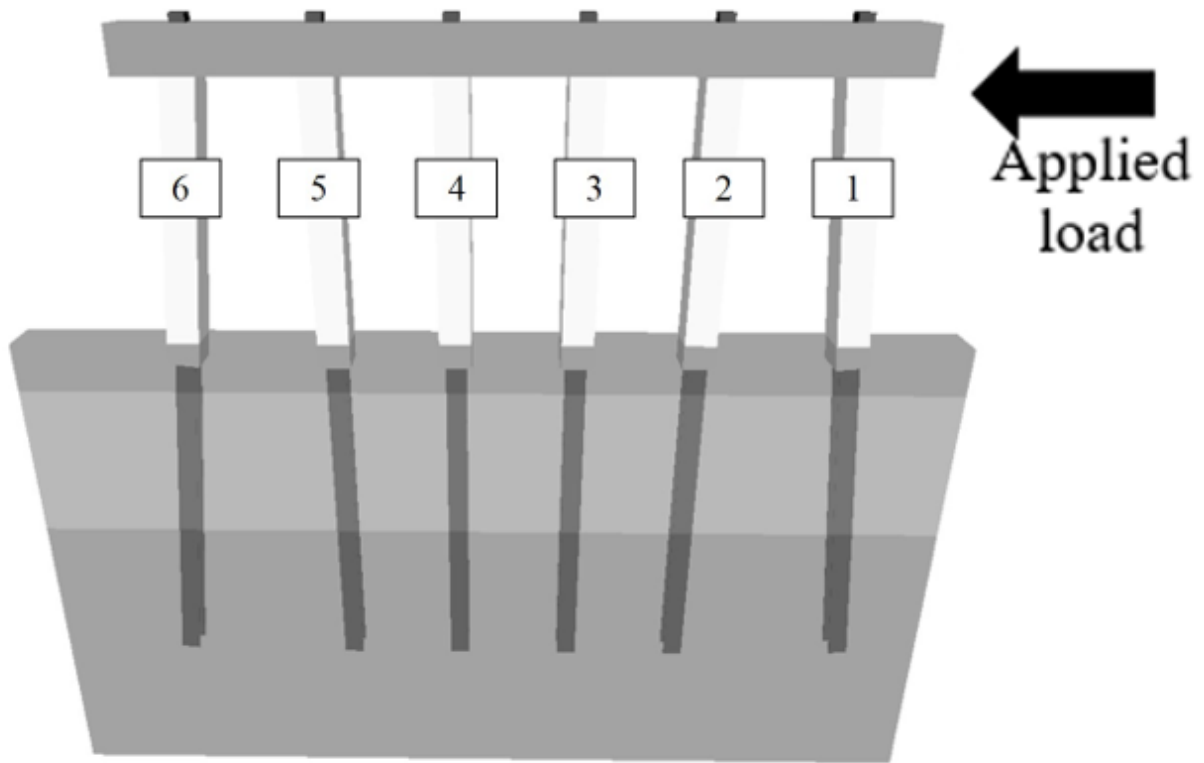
FB Multiplier Rendering of Highway 331 Bridge Bent
